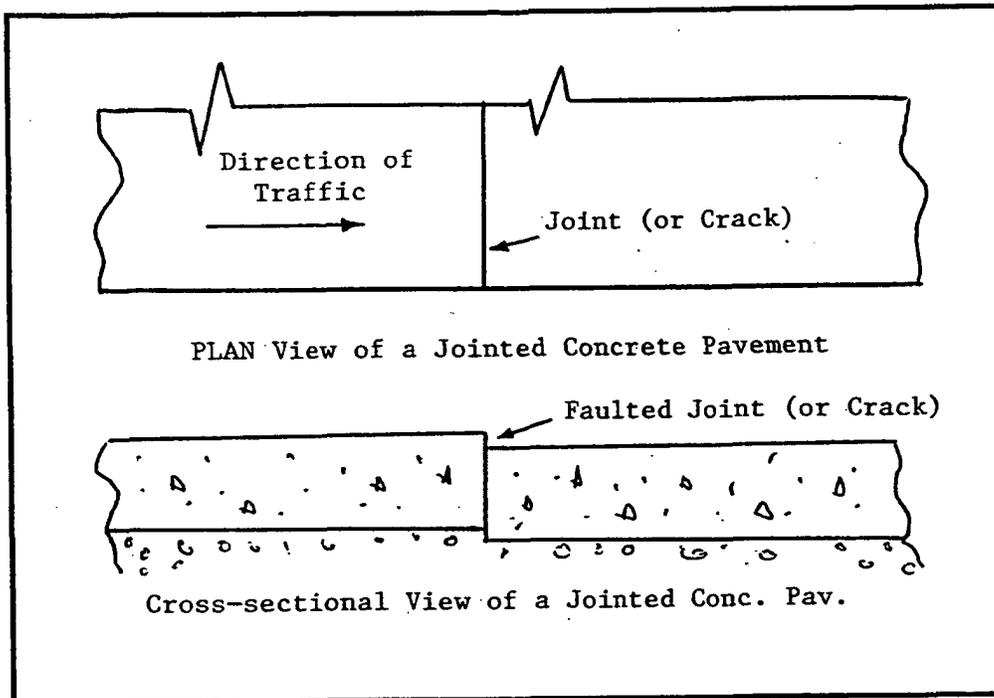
Sketch showing Faulting in Jointed Concrete Pavement
